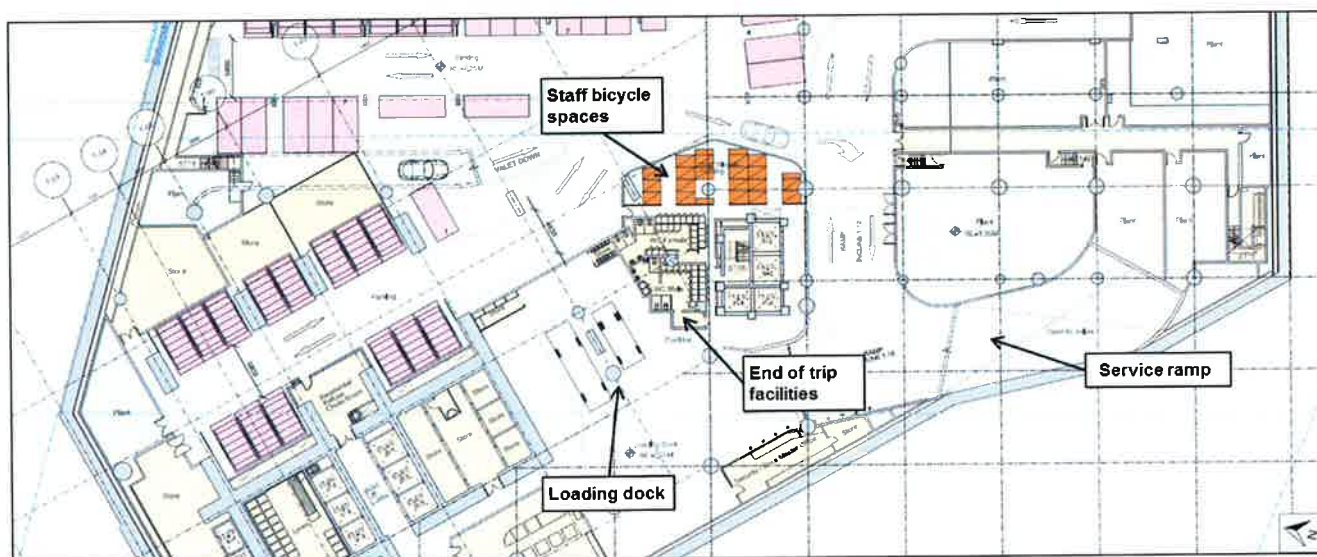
Location of the staff bicycle parking area and associated end of trip facilities at basement level 1 (Base source: Applicant's EIS)
